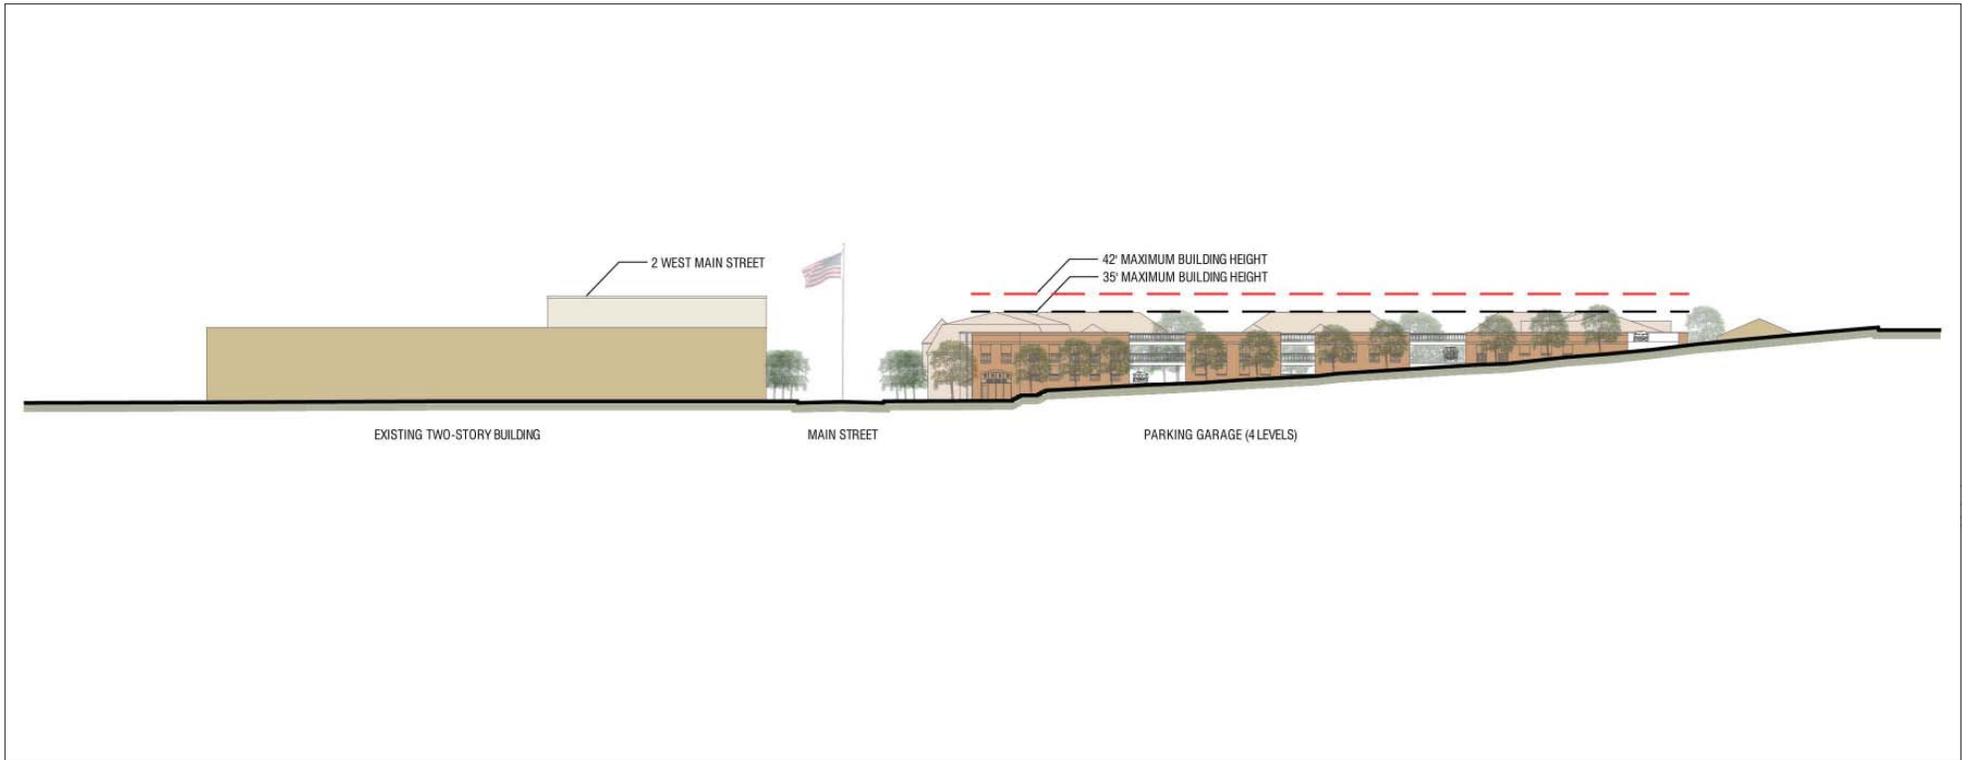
NORTH-SOUTH SITE SECTION - BRIDGE STREET
